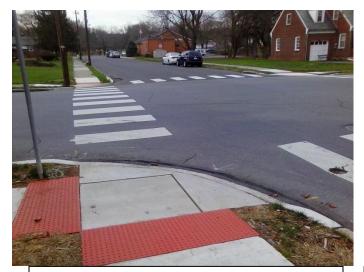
New ADA-Crosswalks at the Water and Northampton Street Intersection
